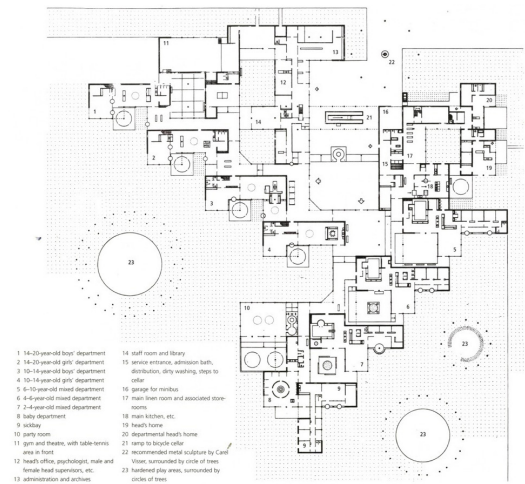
Plan ground floor (Visser, 1960, p. 94)
